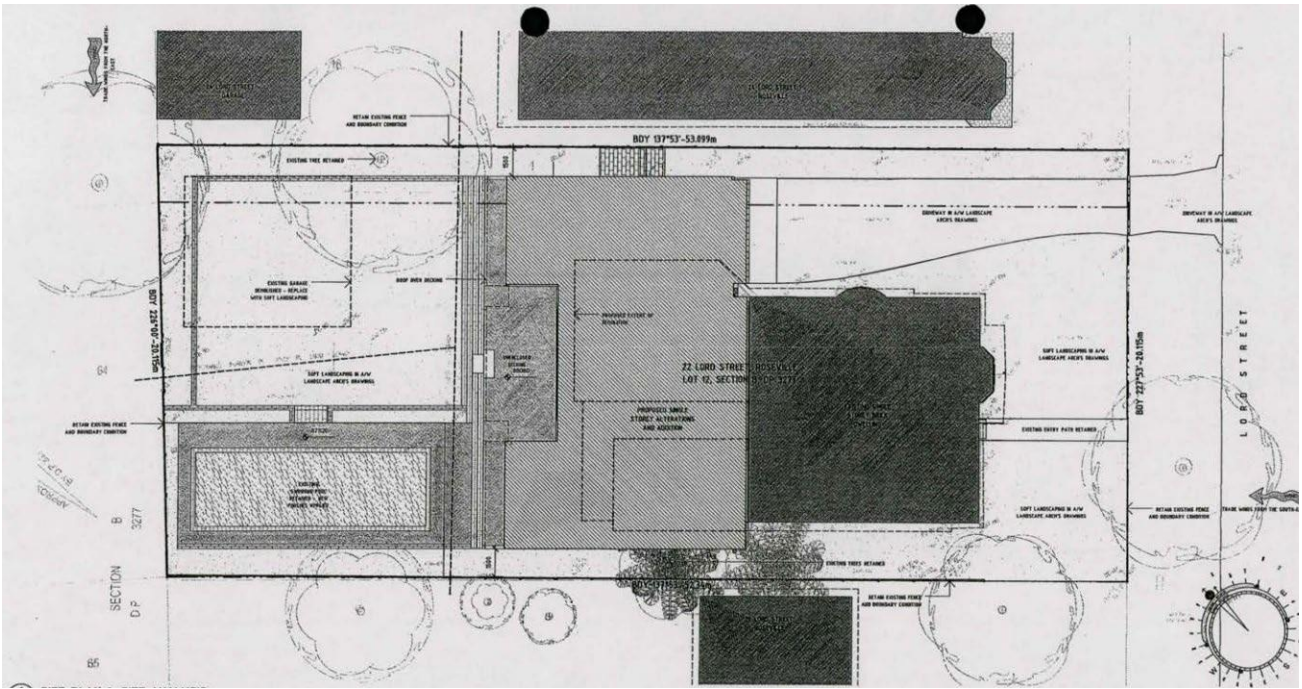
Proposed site plan indicating extent of rear extension dated from 2015
